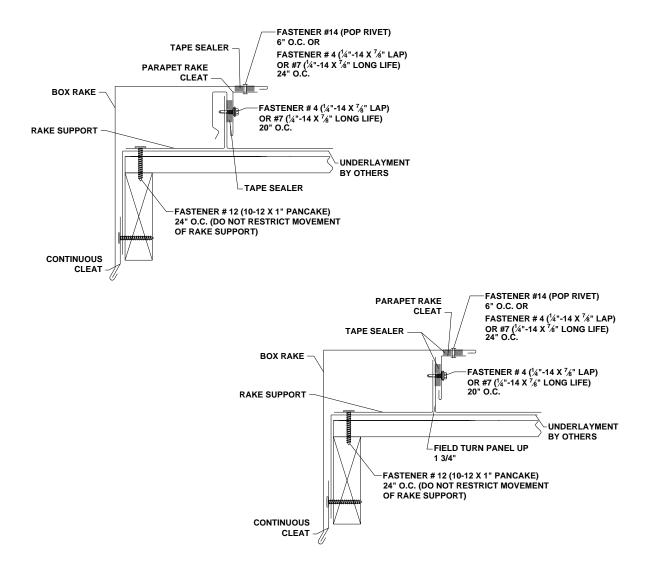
Sidewall/Parapet Floating Rake Flashing Detail
